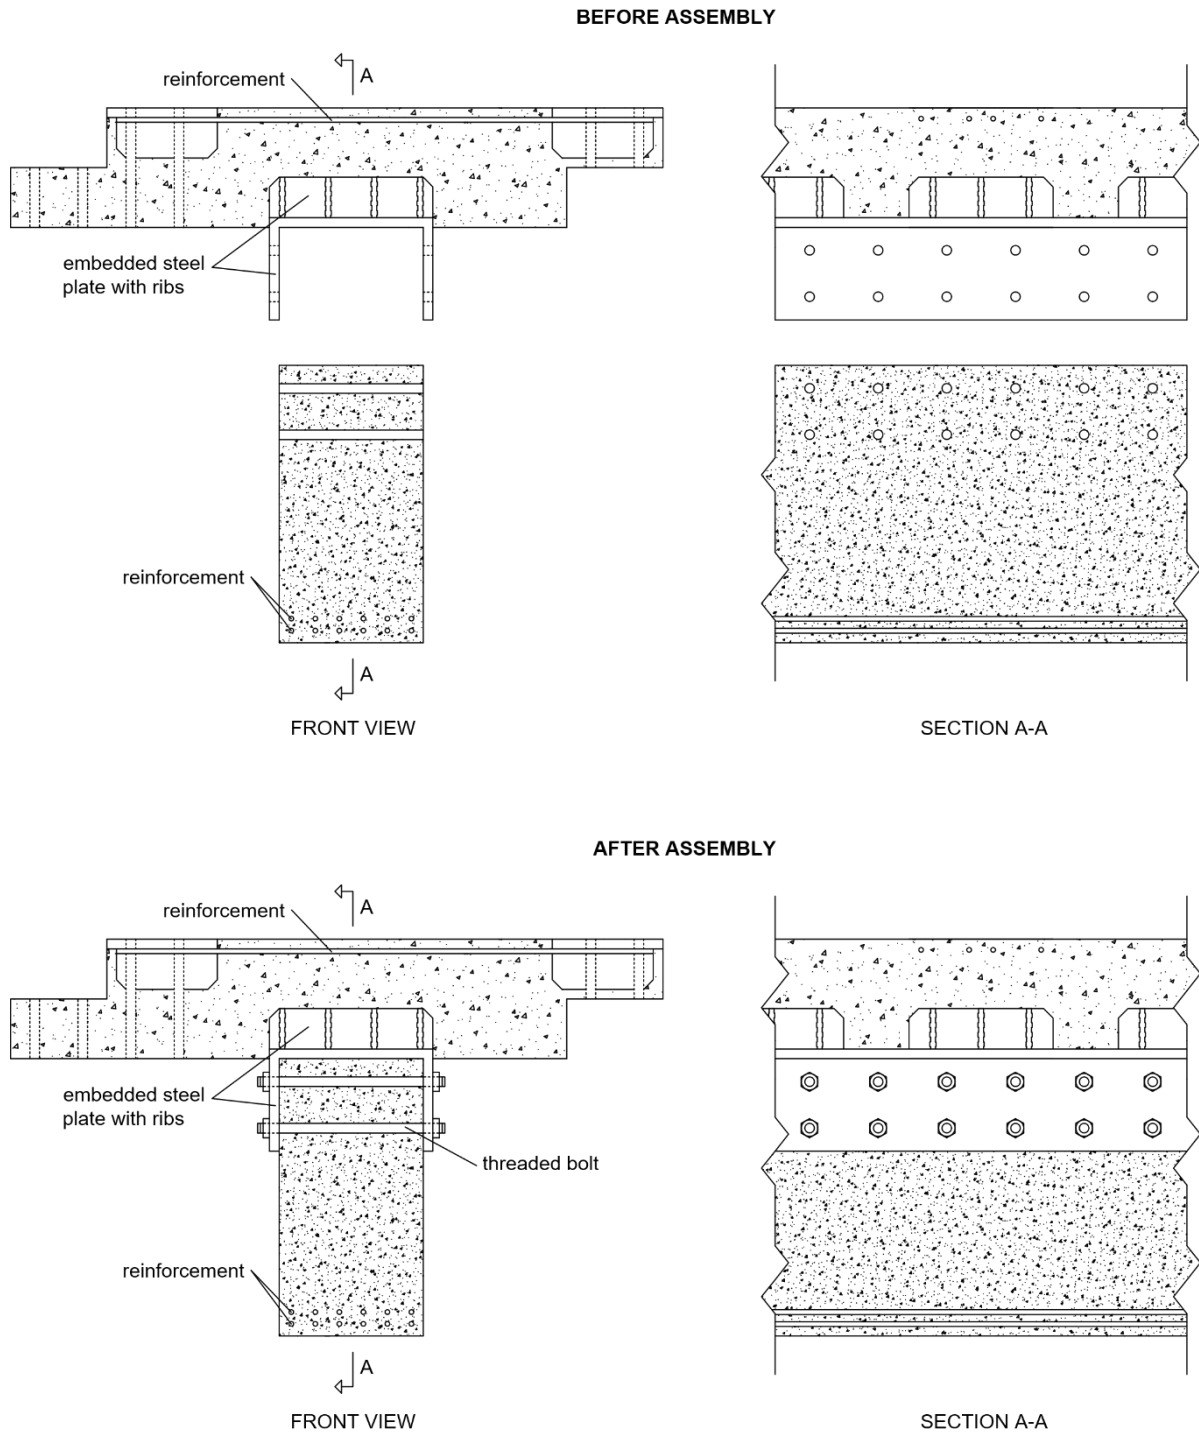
Schematic representation of beam/slab concrete dry connection.
